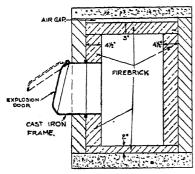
Section through Horizontal Flue showing Explosion Door.
